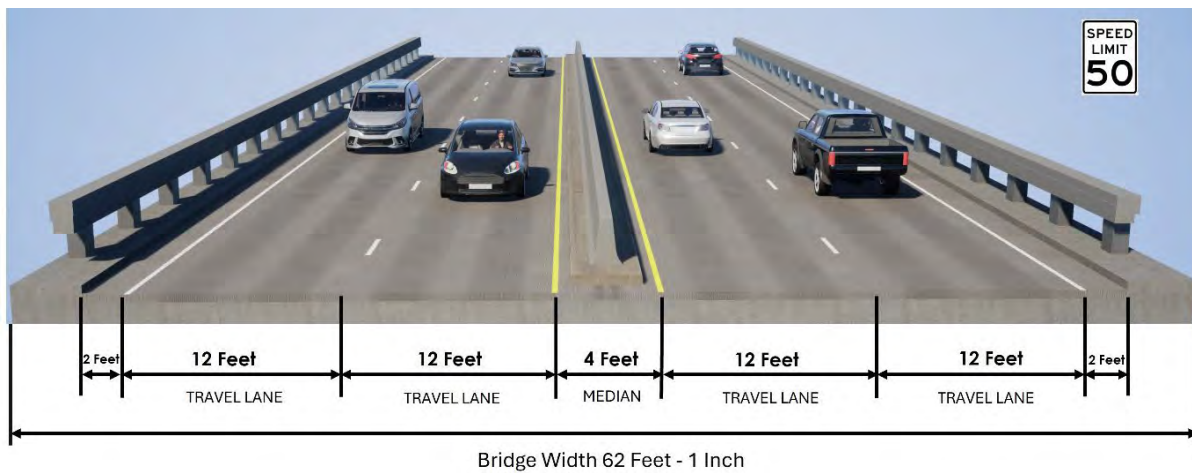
Existing Structure Typical Section: DeSoto Bridge
